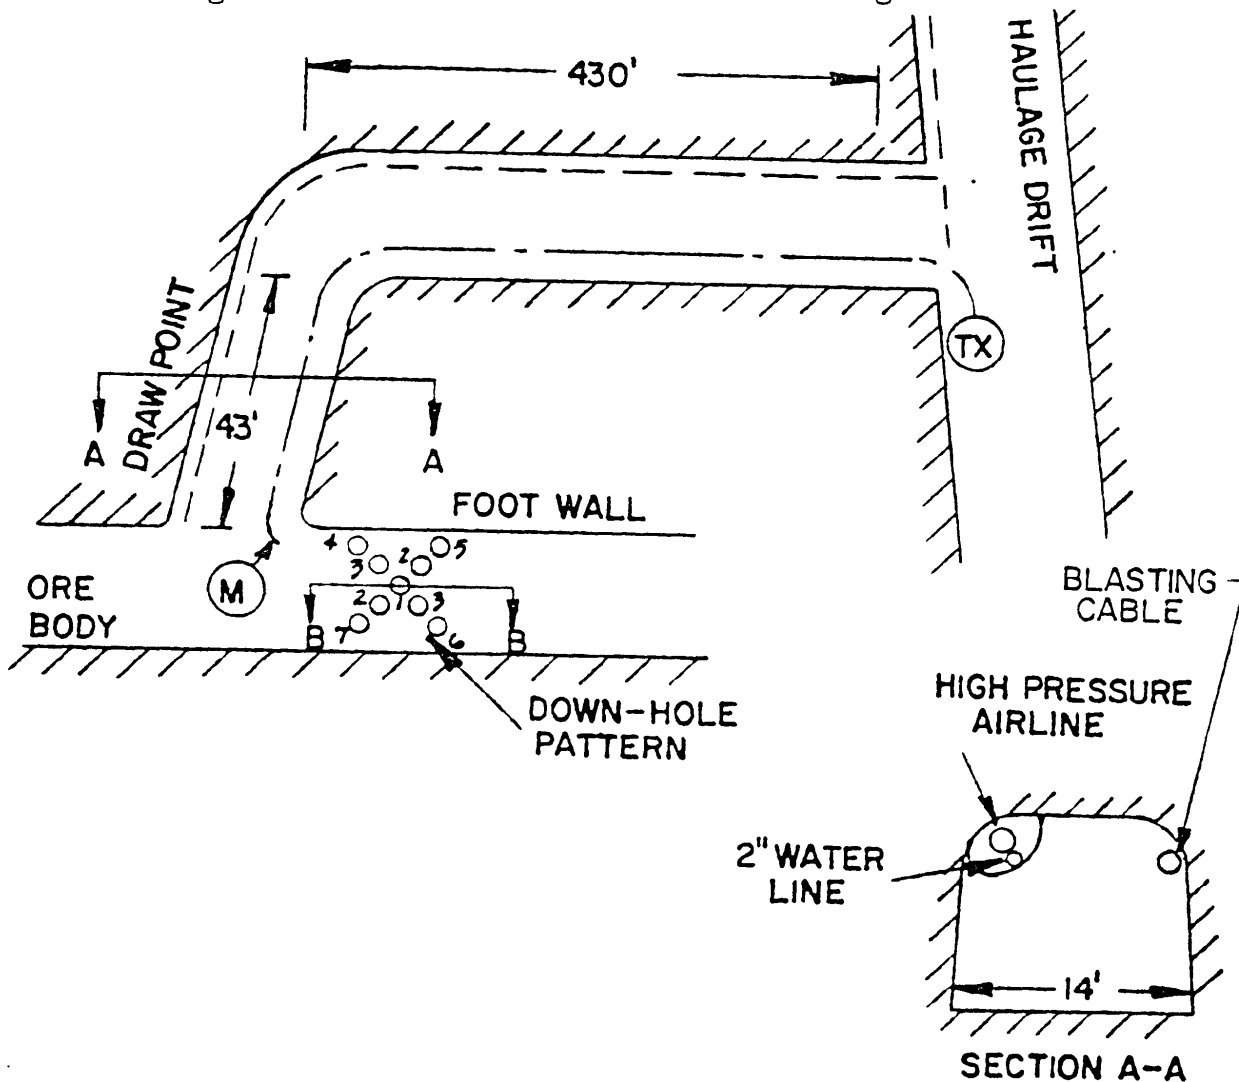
PLAN VIEW AND ENTRY CROSS SECTION OF THE 4970 LEVEL DRILL SUB-LEVEL NORTH UNDERCUT.
